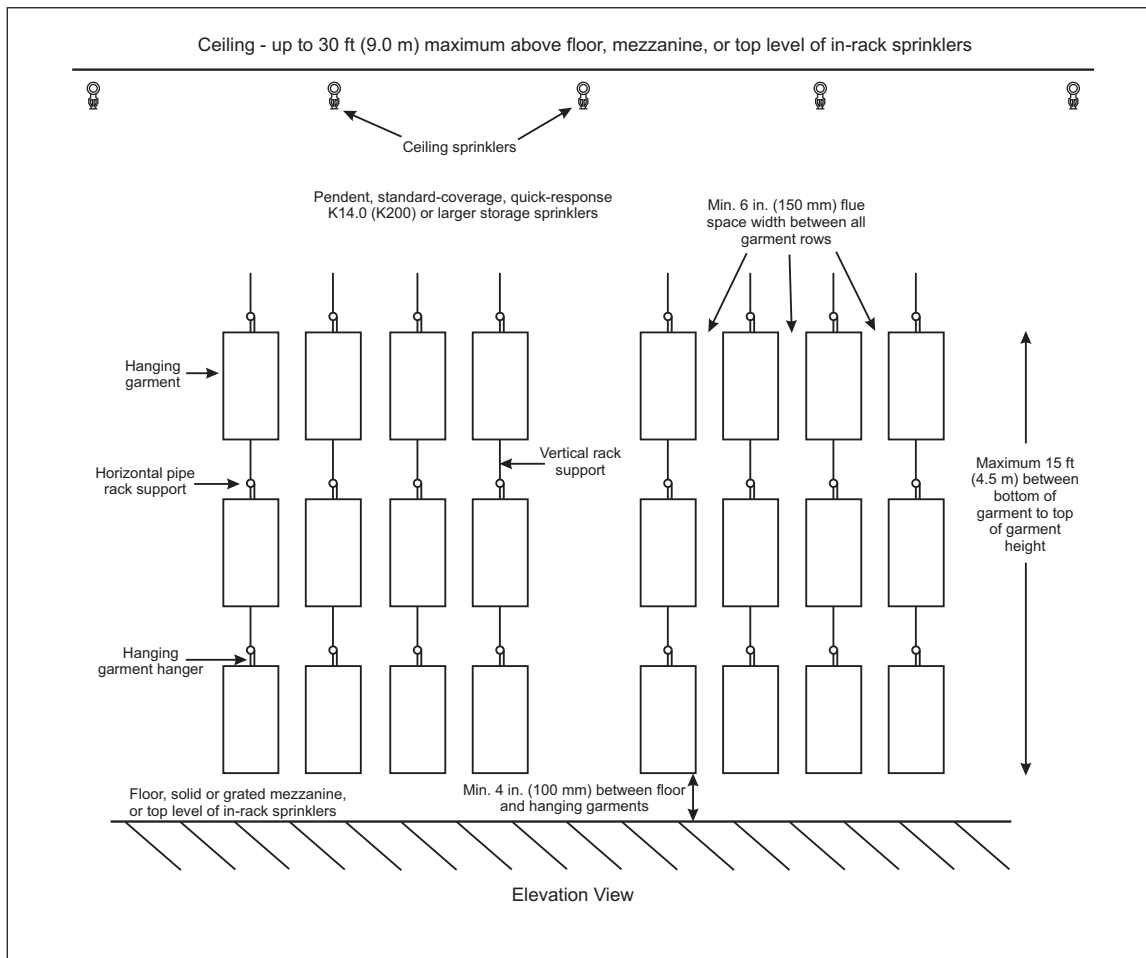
Ceiling-only protection, maximum 30 ft (9.0 m) ceiling, maximum 15 ft (4.5 m) storage, and minimum 6 in. (150 mm) flue space between garment rows (applies to Table 3)
